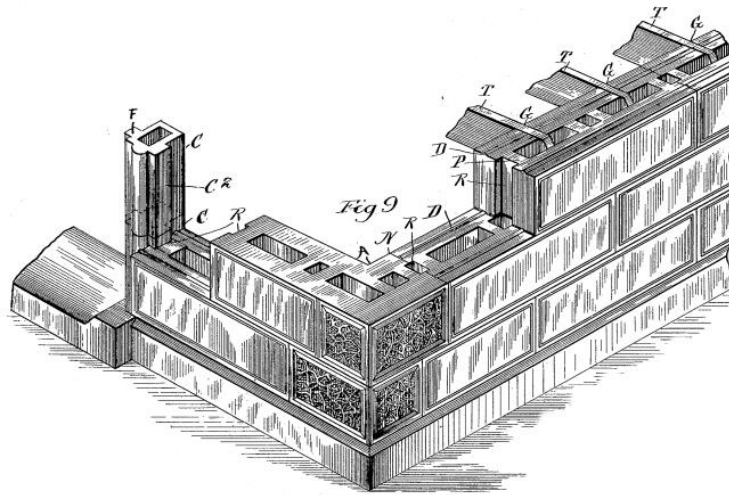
US Patent 674,874 Concrete Wall For Buildings. 28 May 1901
